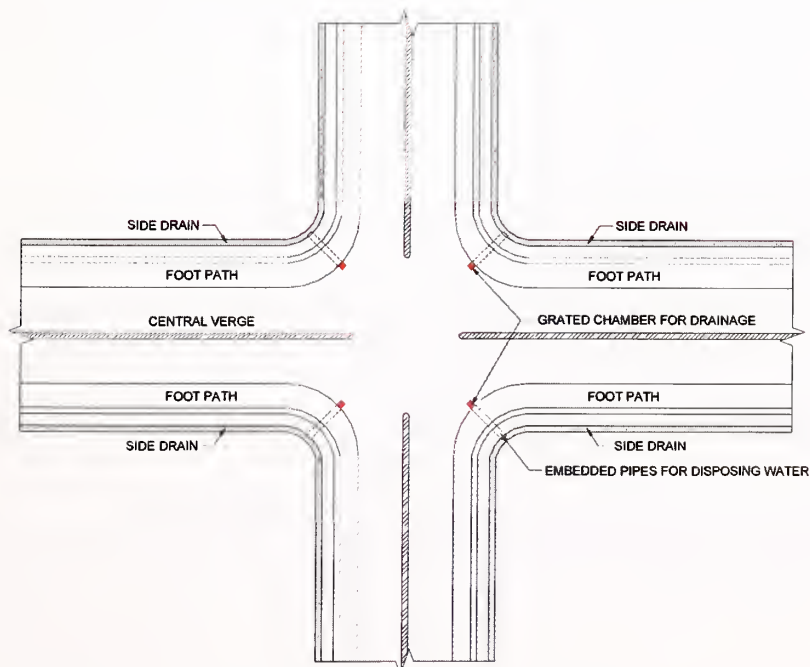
Surface Drainage of a Road Junction (Schematic)
